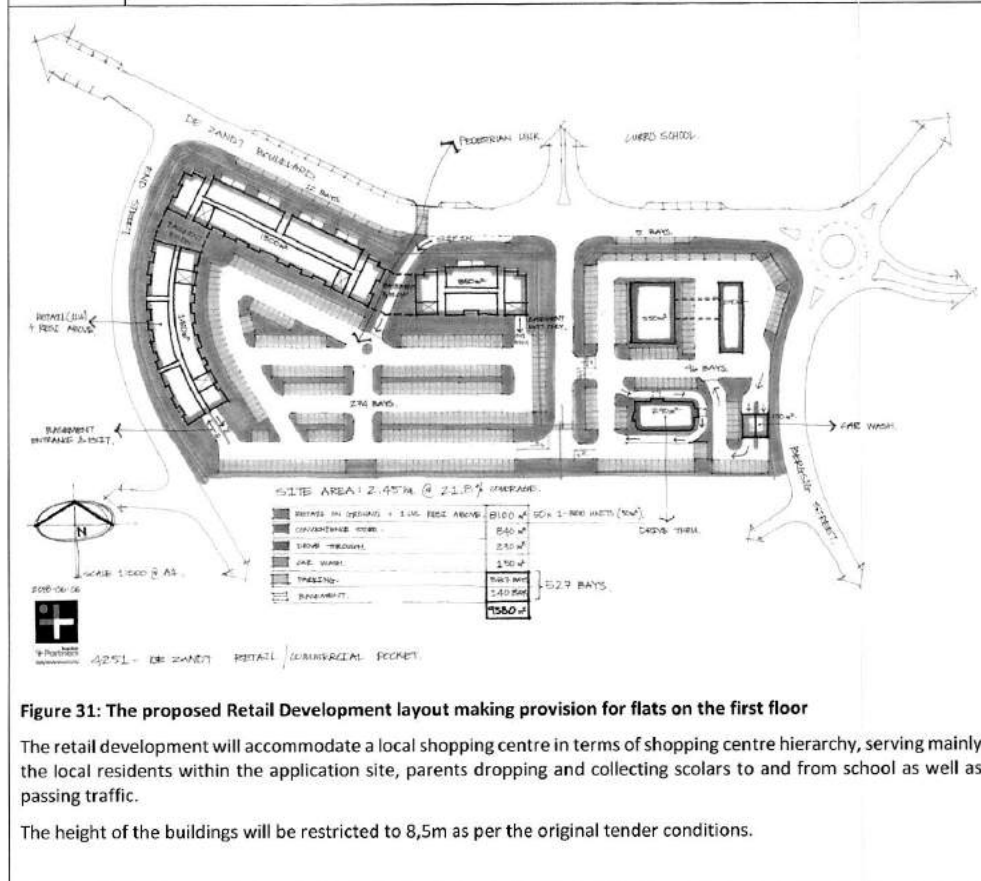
The proposed Retail Development layout making provision for flats on the first floor
